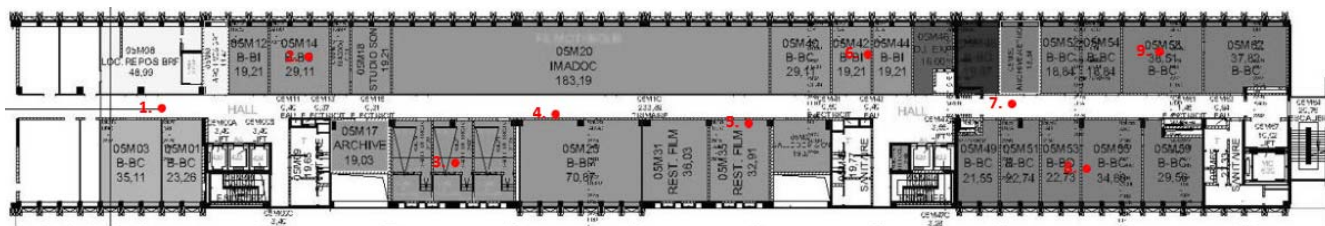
Placement Access Points for Floor 5 in Building CHJM
